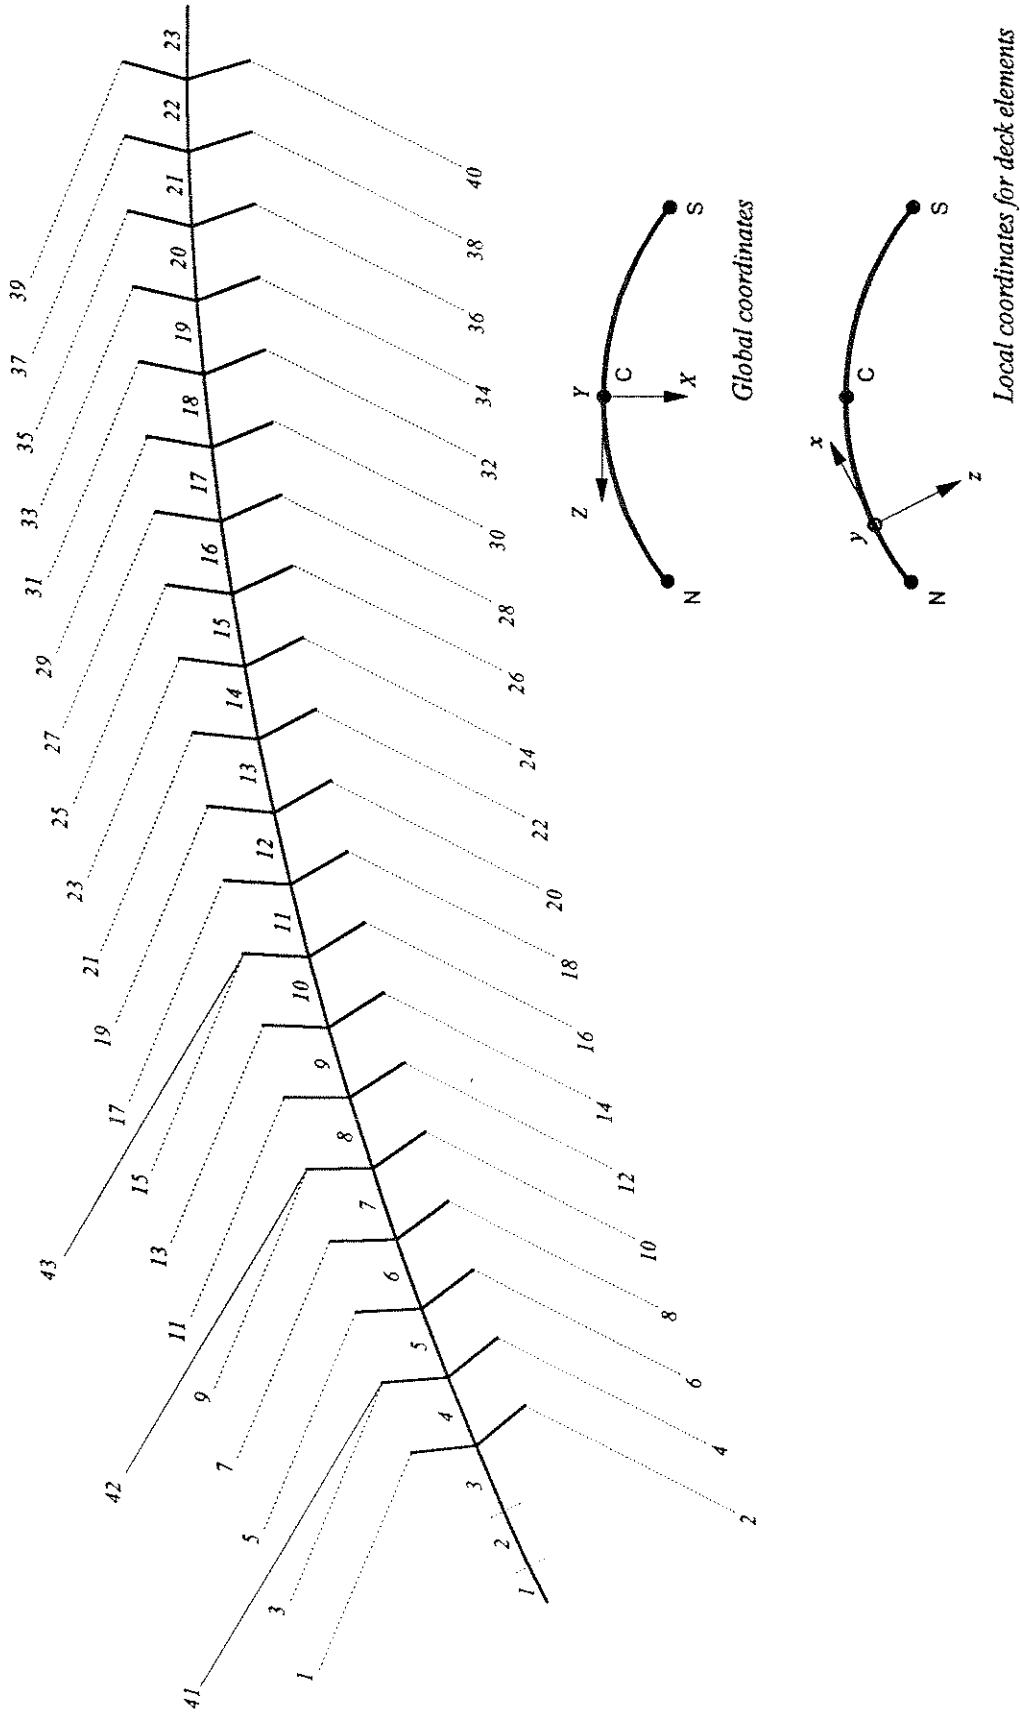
PLAN SHOWING ELEMENT NUMBERS; RUCK-A-CHUCKY CONCRETE BRIDGE
